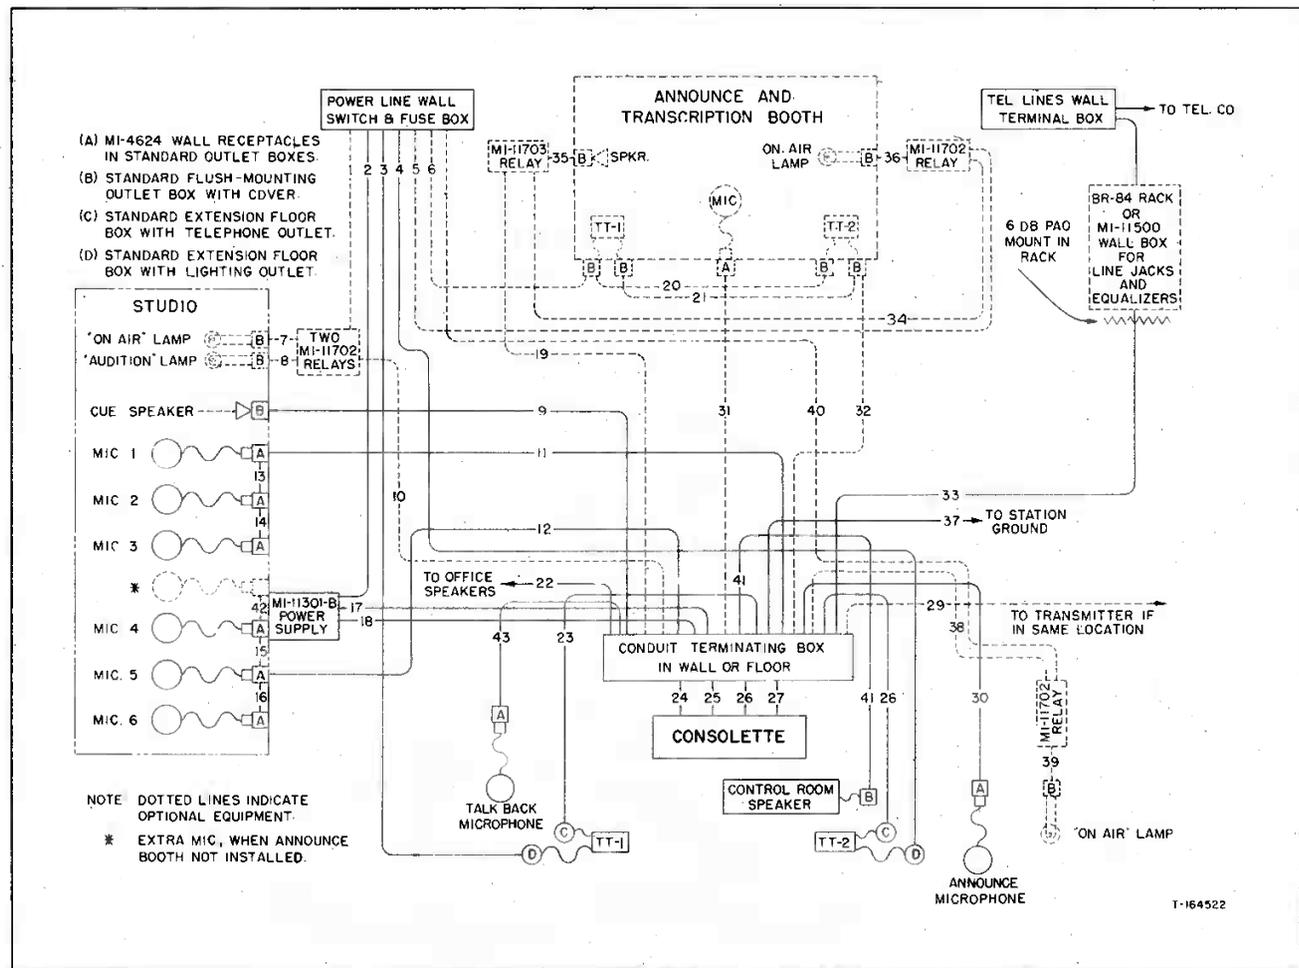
Typical Conduit Layout for Single-Studio Installation
